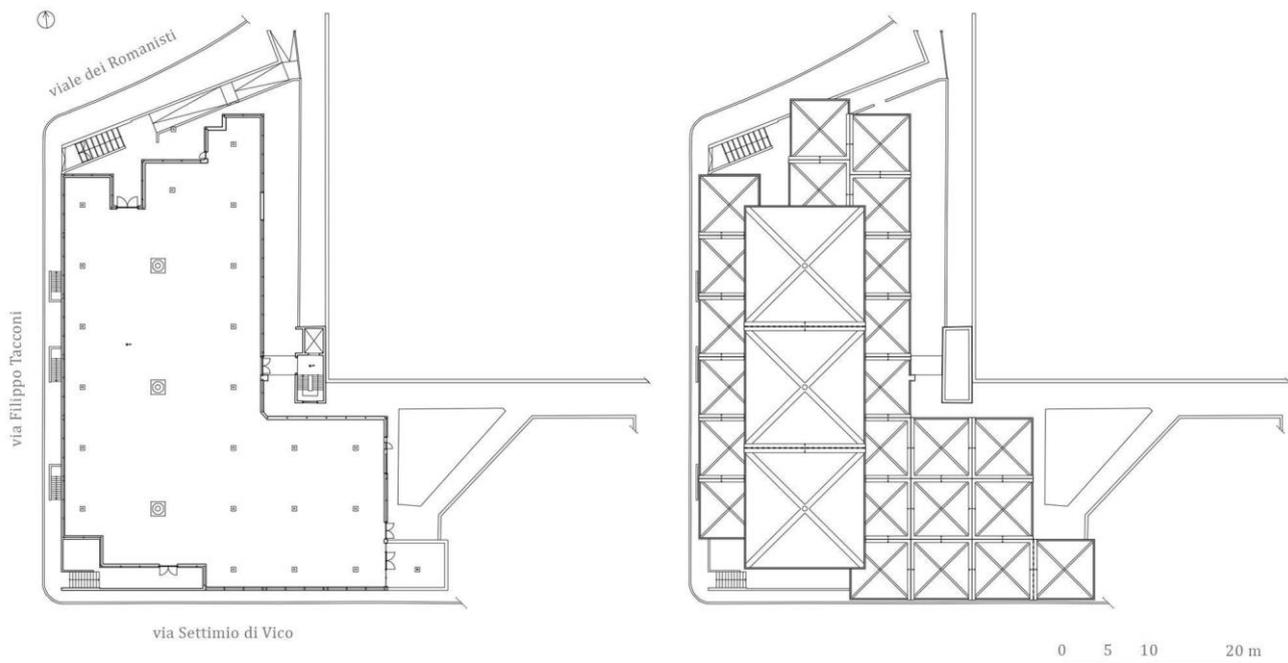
Reconstruction of the ground floor plan and the roof plan (graphic elaboration by the authors).
